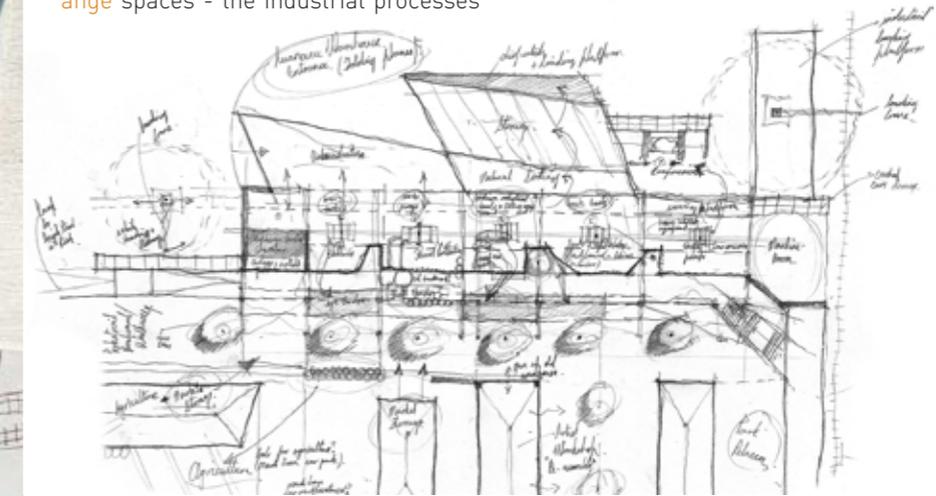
Concept drawing of the building layout, Illustrated by Author 2011
